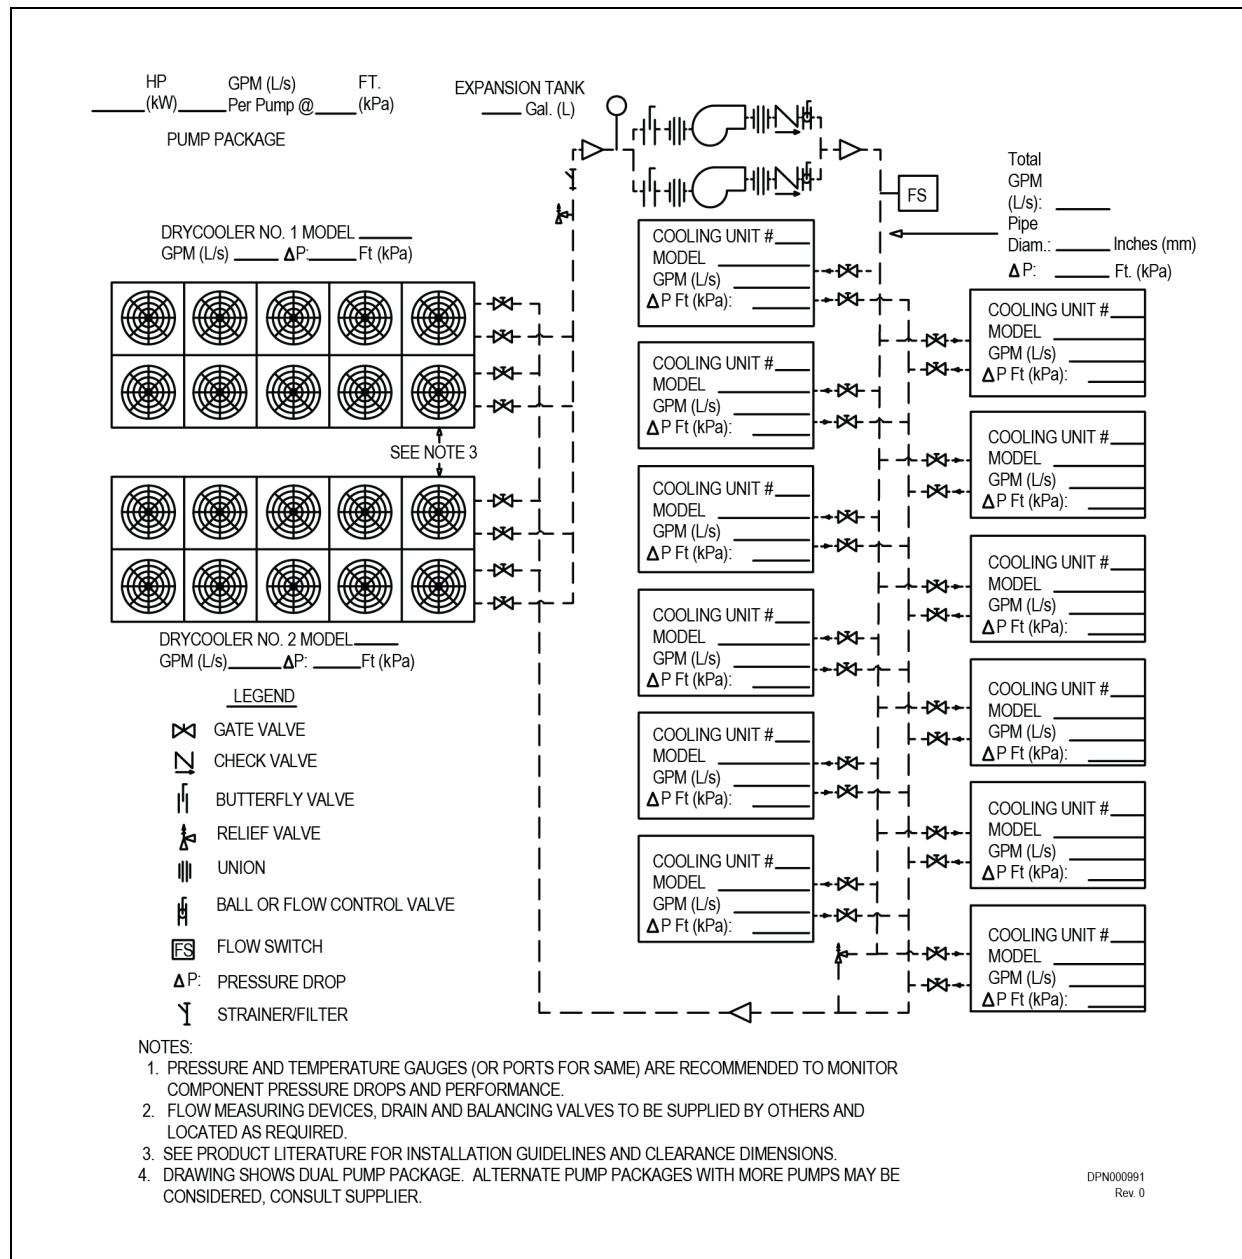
Typical piping arrangement, multiple drycoolers and multiple indoor units
